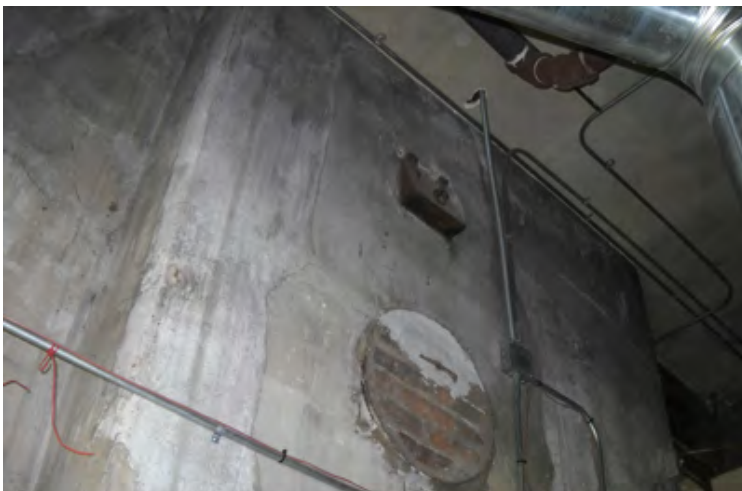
Two vent locations are positioned on the north wall chimneystack. The lower opening is for a former boiler. The upper opening, now a clean-out, was probably originally a vent opening for a stove.
